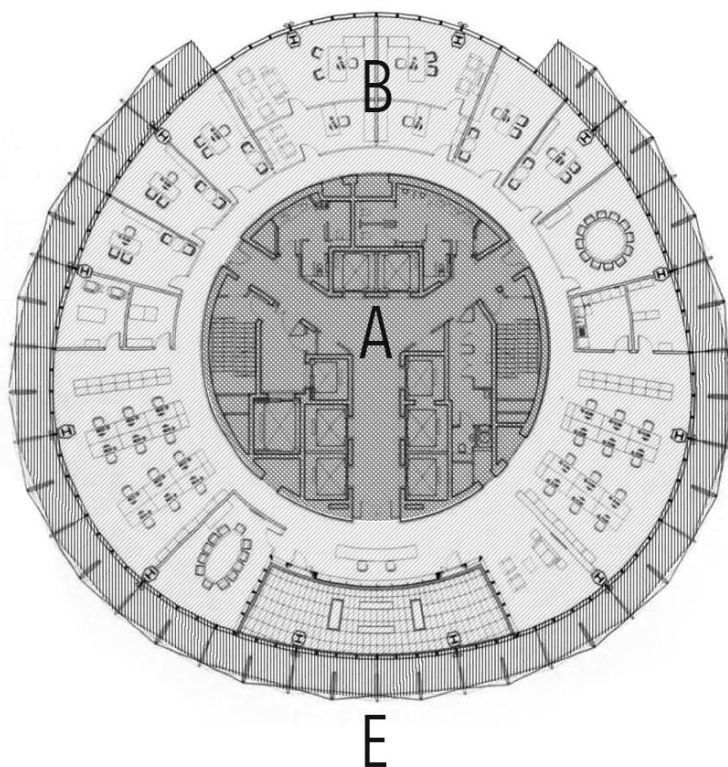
Structural analysis of the floor plan of the repetitive floor of Al Bahar Towers (2012) in Abu Dhabi, architect: Aedas Architects. Designations: A - vertical communication-sanitary zone, B - office space zone, E - active (shaded) facade zone. Source: Hyoungsub 2015.
